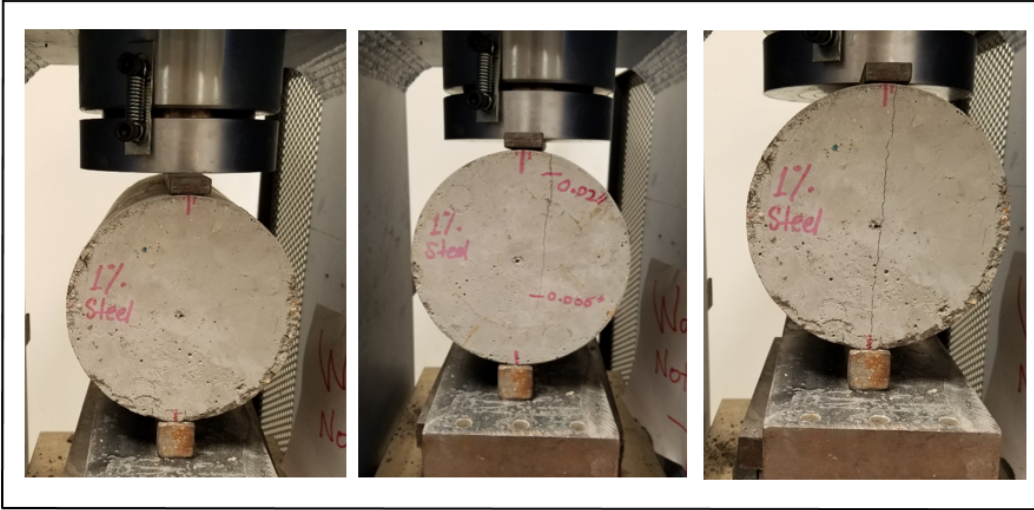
21. Cylinder Tensile Failure SFRC1%
